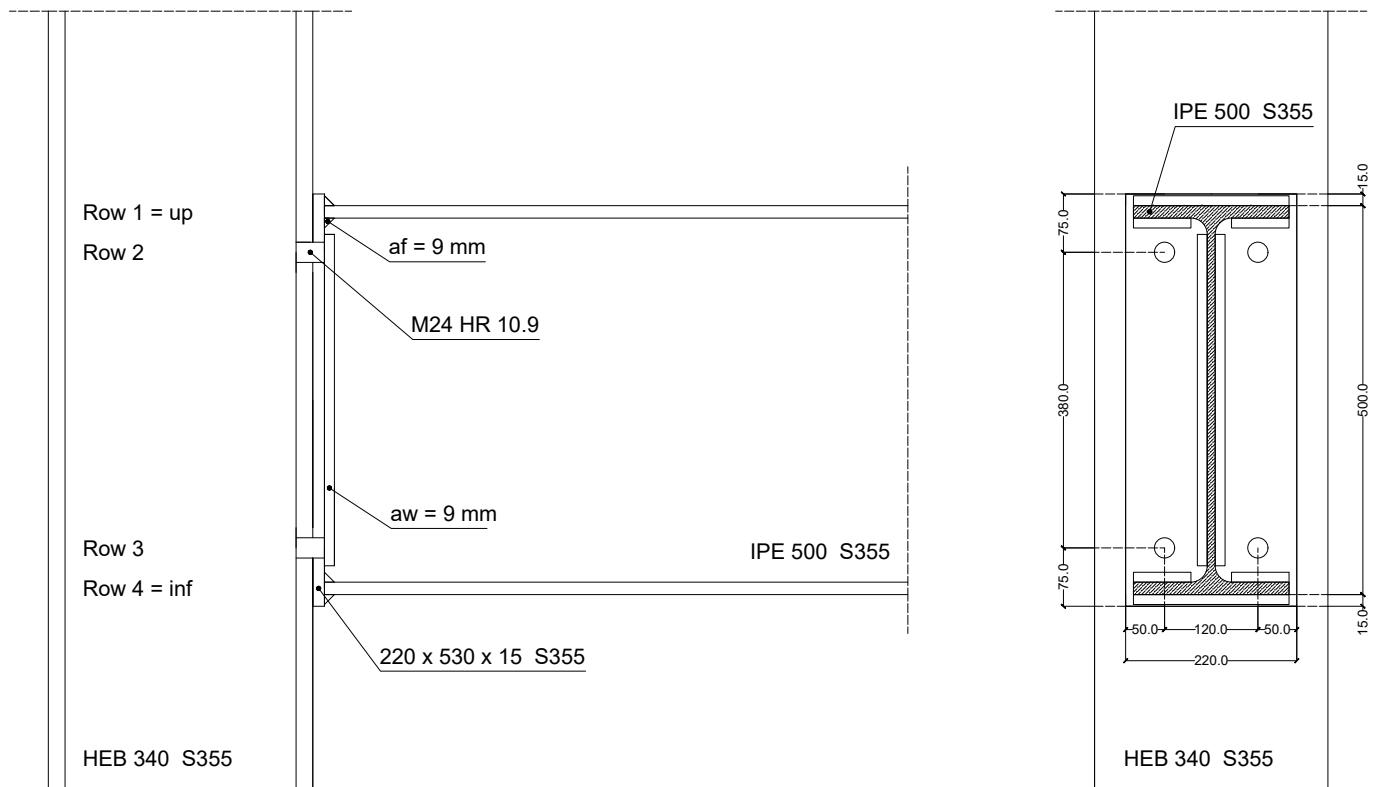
FAILNOMORE - Joint configurations A1 - Technical drawing
